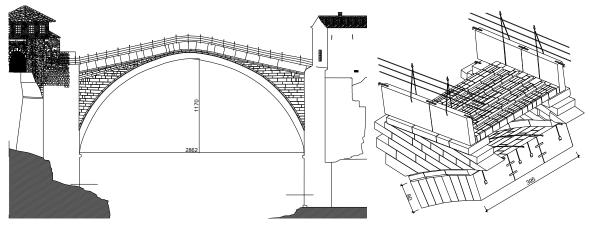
CAD sketch - Southern view (cm) Fig. 3 CAD sketch - Cross section (cm)
